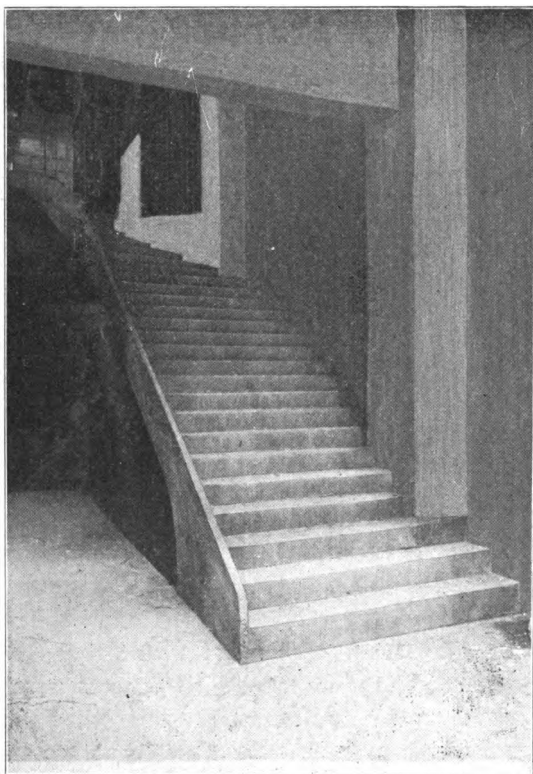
Staircase, Ingall's Building, Cincinnati, O.
